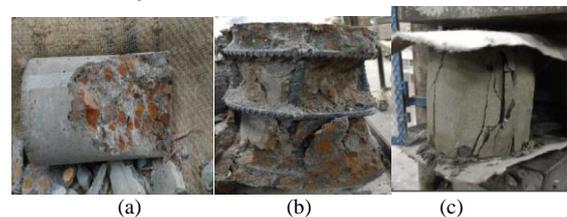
(a) Shear Failure of Control Cylinder; (b) Shear Failure of RC Jacketed cylinder; (c) Spalling and Shear Failure of Ferrocement Strengthened Cylinder
